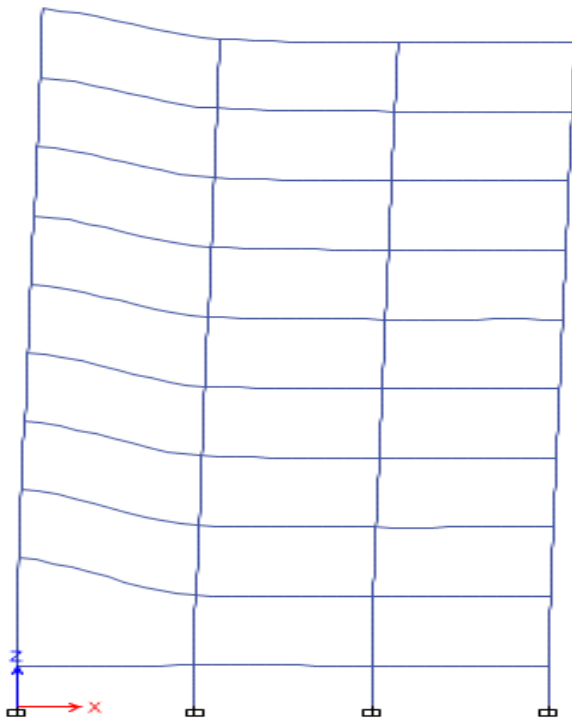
Deformed form of Ground Floor Corner Column at 1000°C
